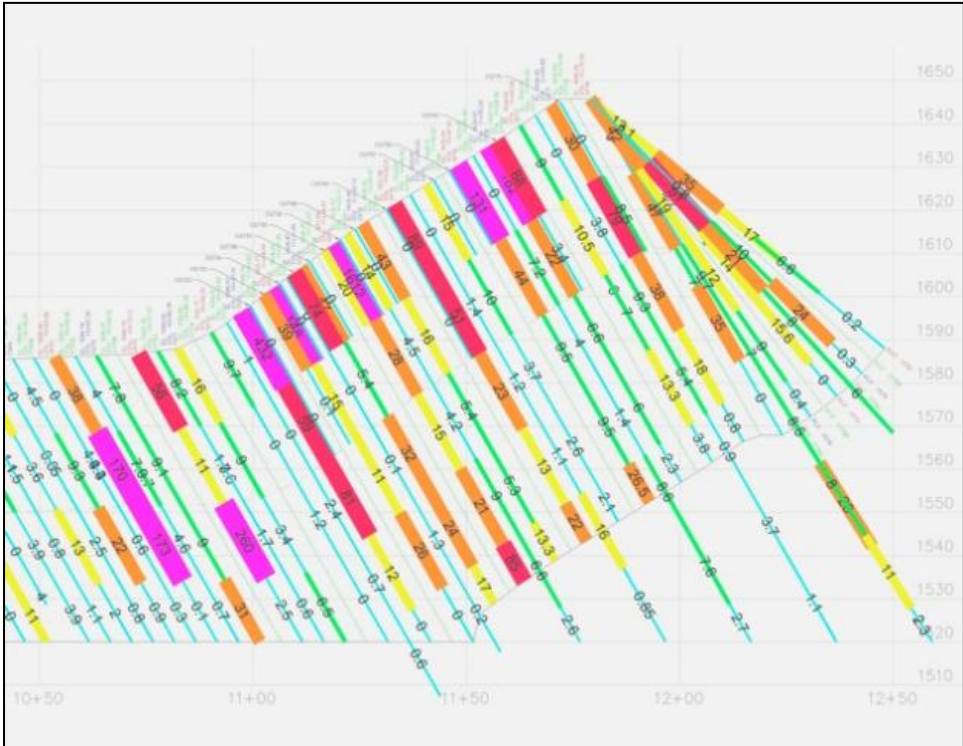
Detailed geologic profile being developed as part of grouting.
